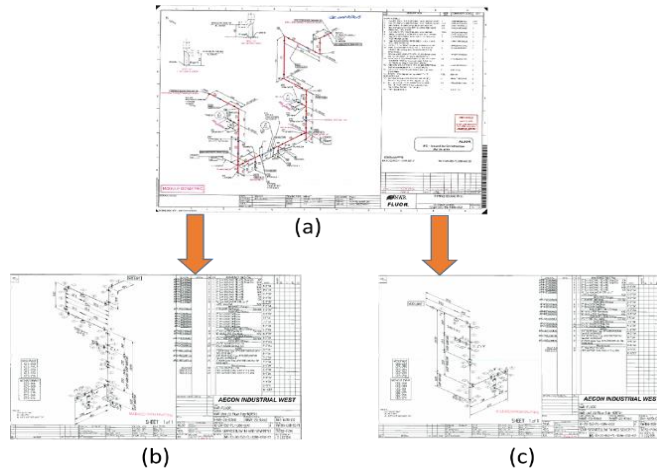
Single isometric translated to multiple cutsheets. (a) Isometric drawing. (b) and (c) cutsheets derived from a single isometric drawing (refer to Appendix C for larger images).
